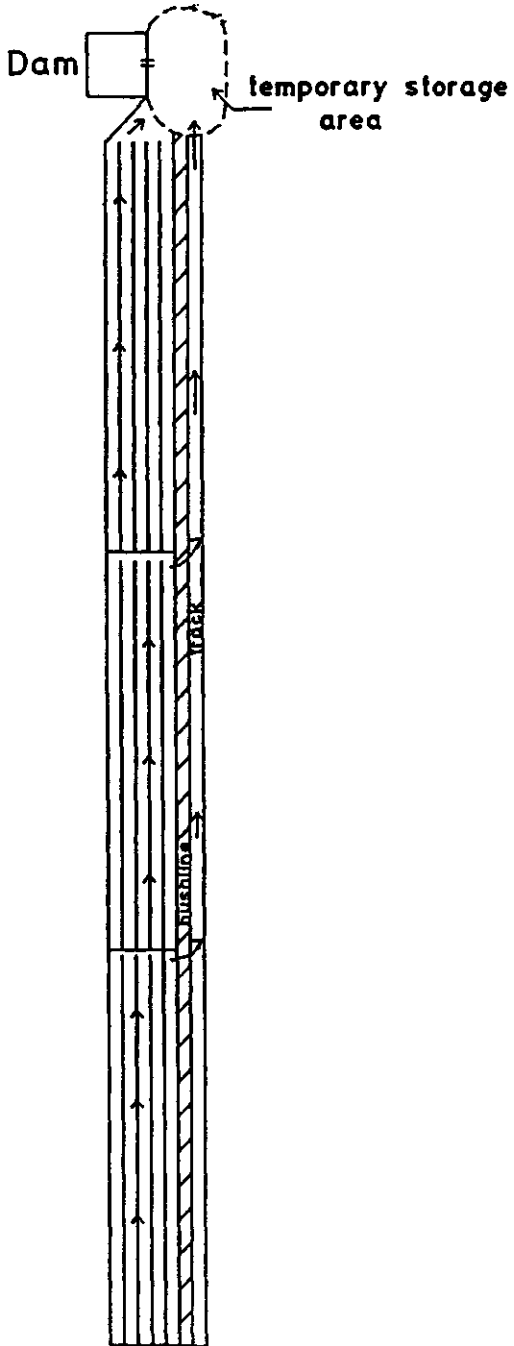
Plan view of a dam and roaded catchment design (Farm 2).
